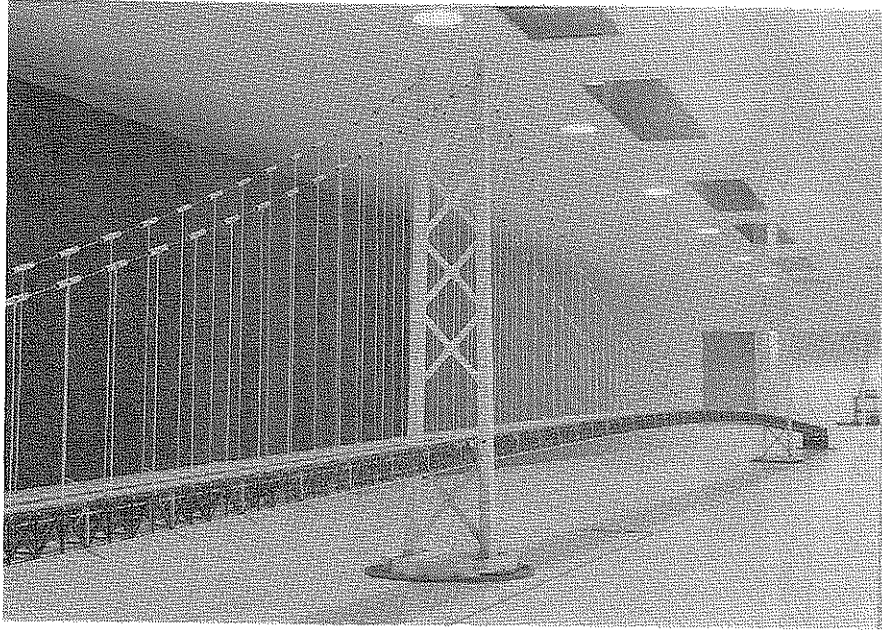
Full model test of the Akashi-Kaikyo Bridge
